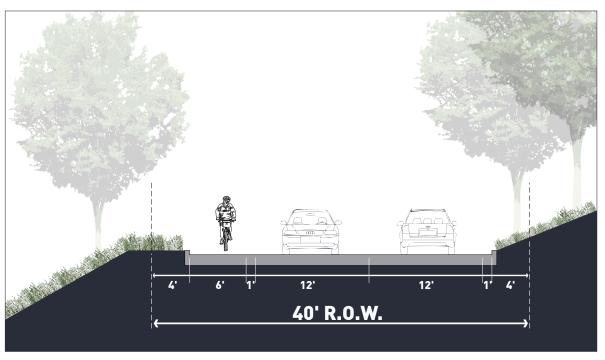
e: Treasure Island Road-Viaduct, typical streetscape section
